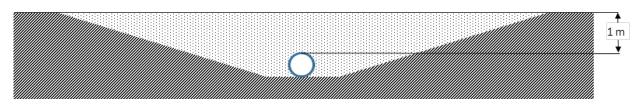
Pipeline trenching outside fairways. (Ramboll 2014a)
